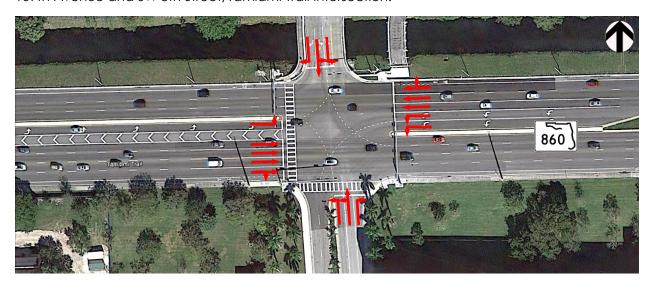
SW 109th Avenue & SW 8th Street Intersection Configuration
